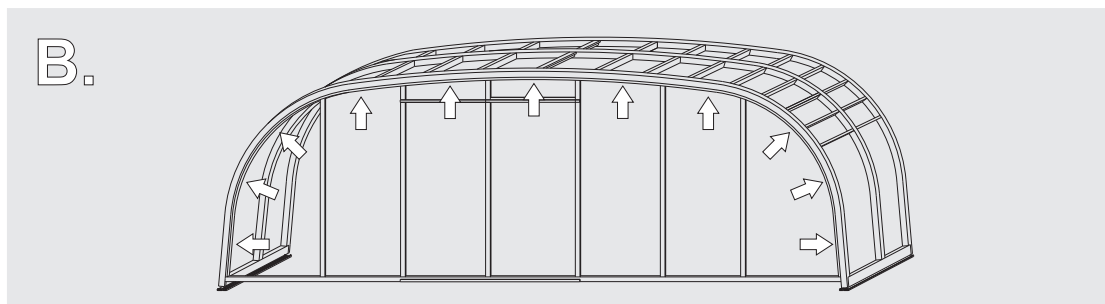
b - put the inner front to the bottom surface of the bearing profile of the segment
